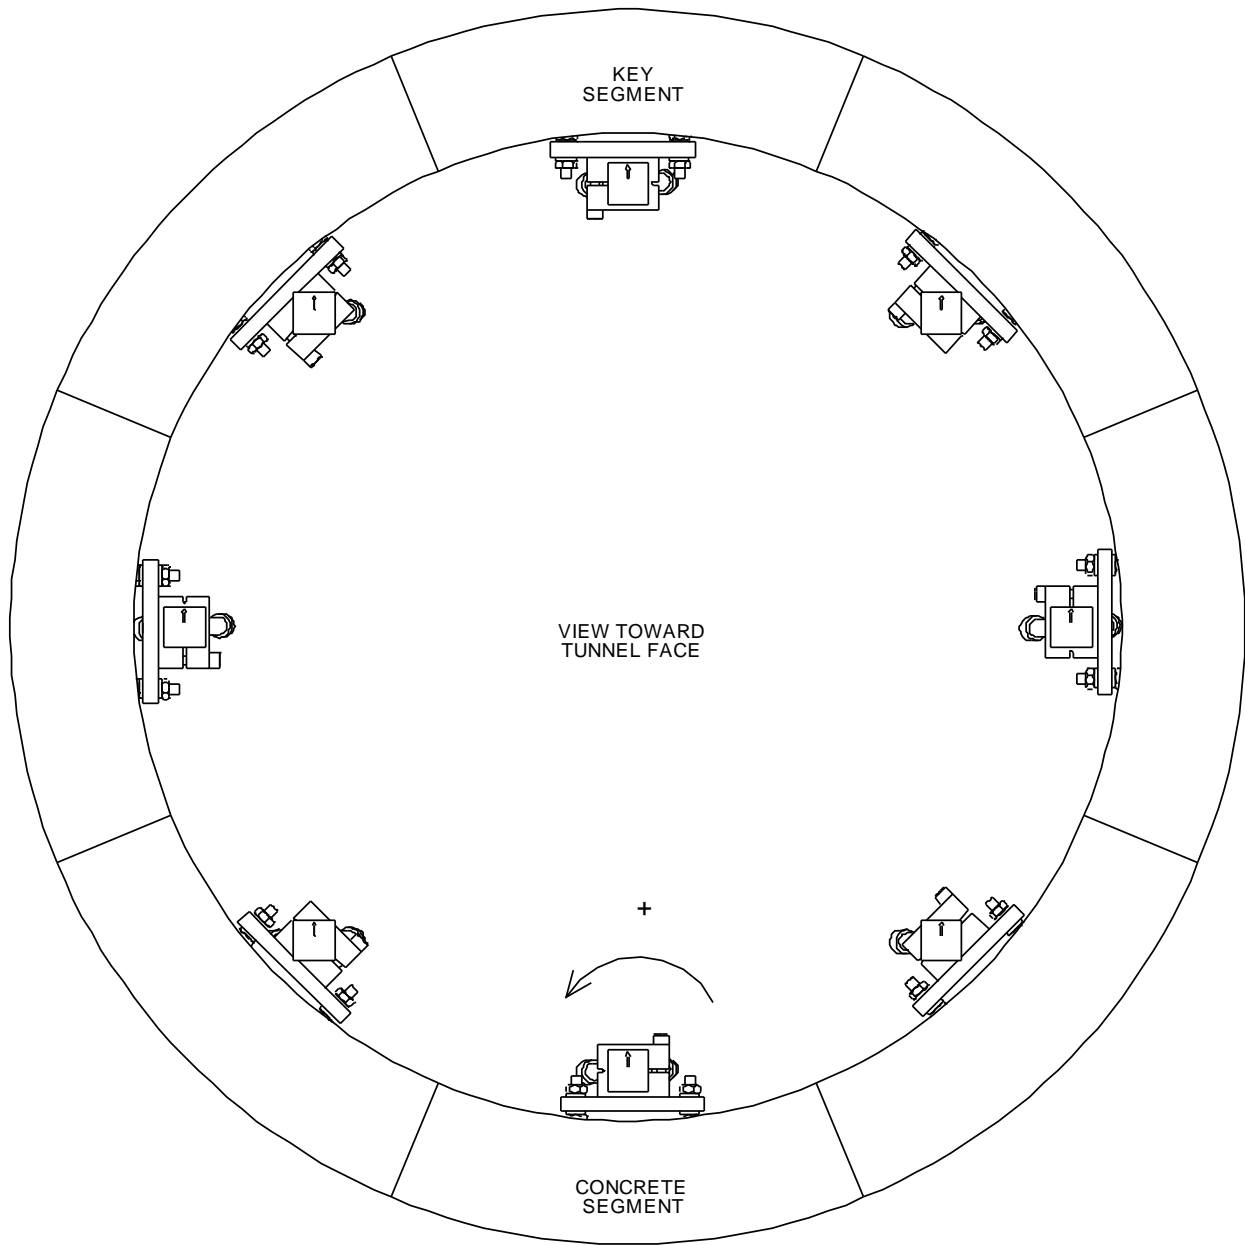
Tunnel Convergence Meter installed on concrete segments in tunnel
